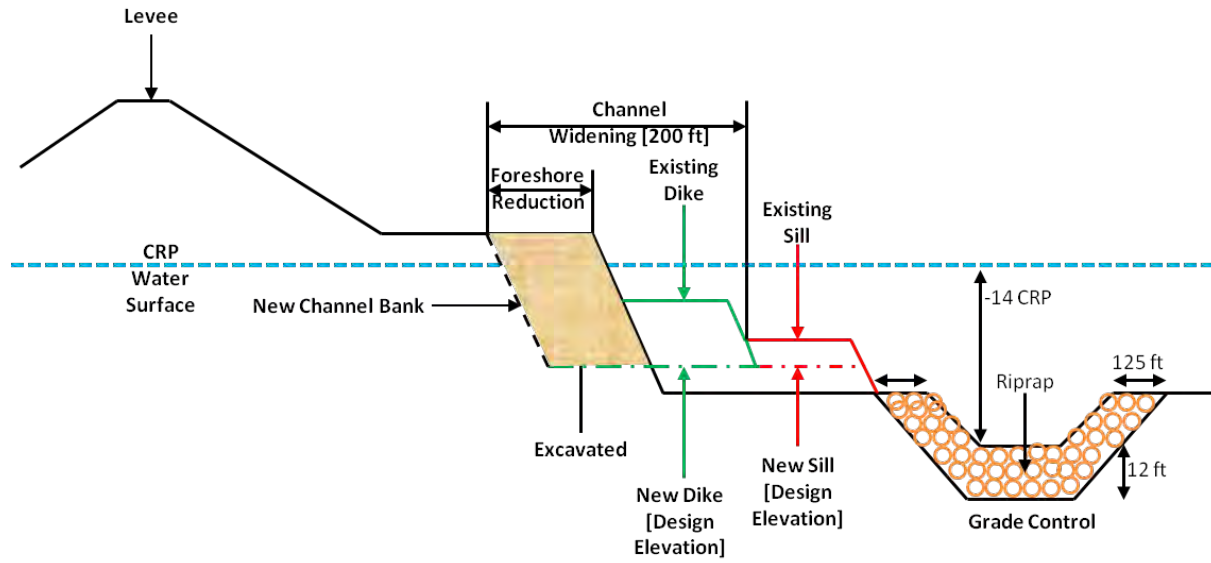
Schematic showing Alternative 5 with both dike and sill lowered to same elevation, 200 ft landward channel widening, and channel grade control
